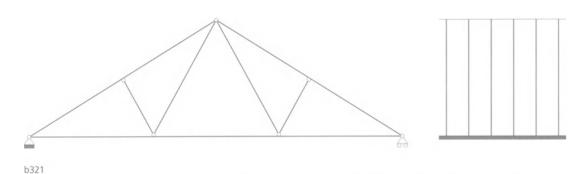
shows the structural system of roof trusses and trussed rafters.
